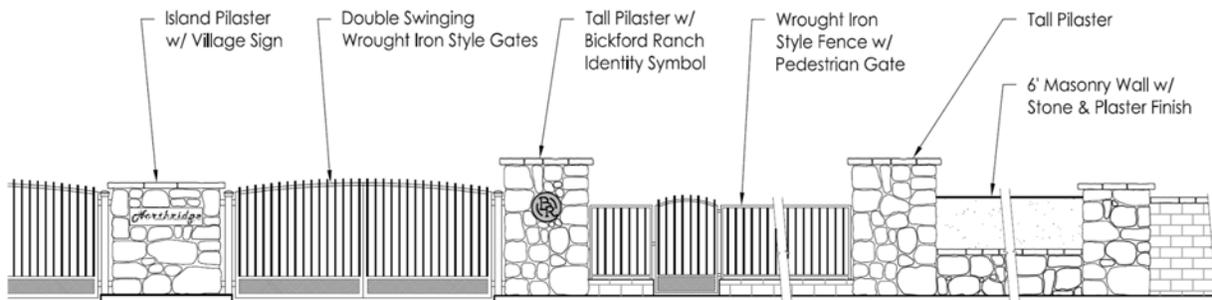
| Gated Village Entrance Typical Design (Elevation View)
